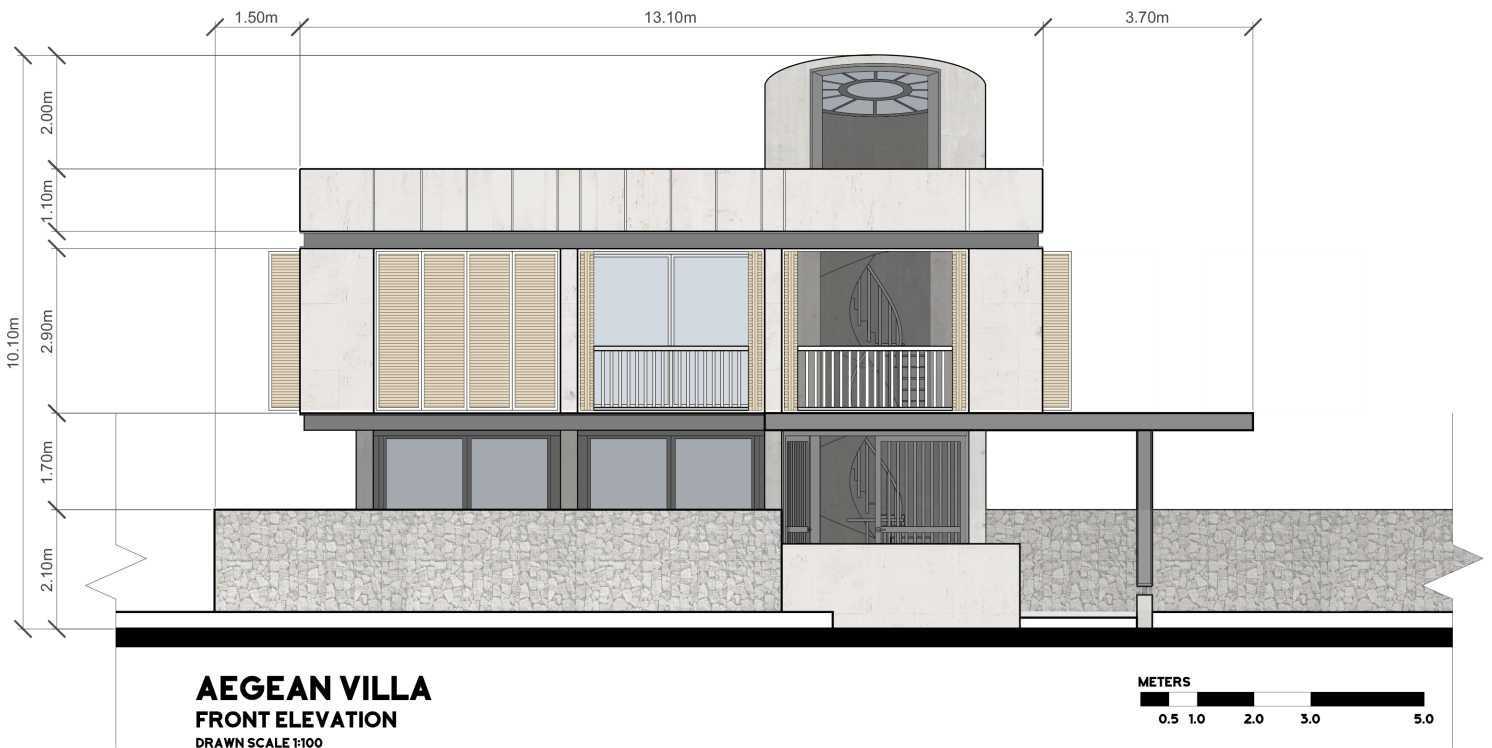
Aegean Villa elevation. Two-meter gabion on the garden perimeter provides visual privacy on the ground level. Building is elevated three steps above the garden level to allow for a transition space between garden soil and the paved interiors. Ground level can be completely opened to the outside, rendering the whole garden a part of the house.
